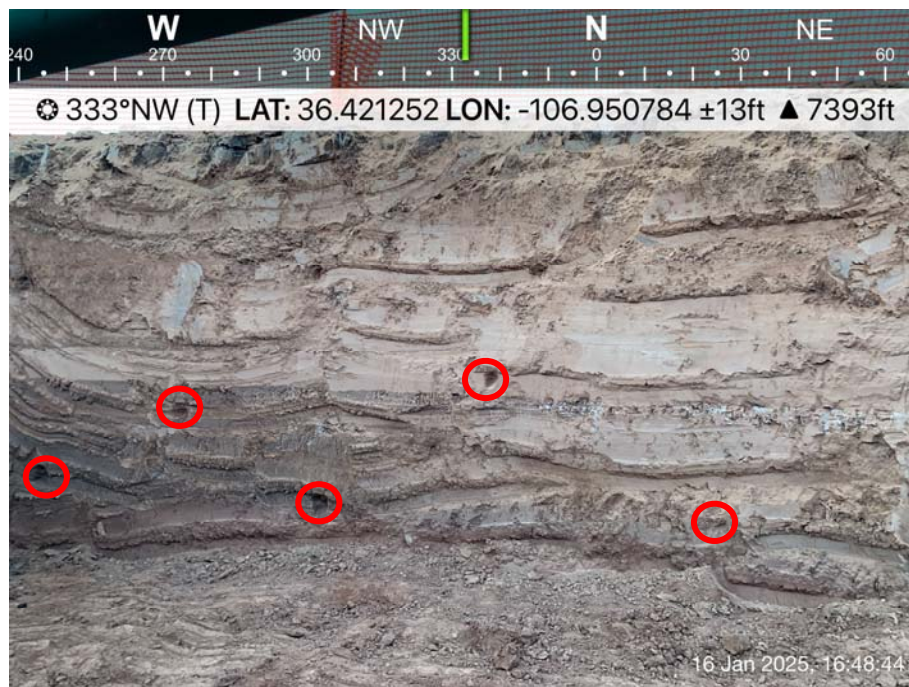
SS12 collected as a five-point composite sample 4-10 ft bgs from northwest sidewall of excavation.
